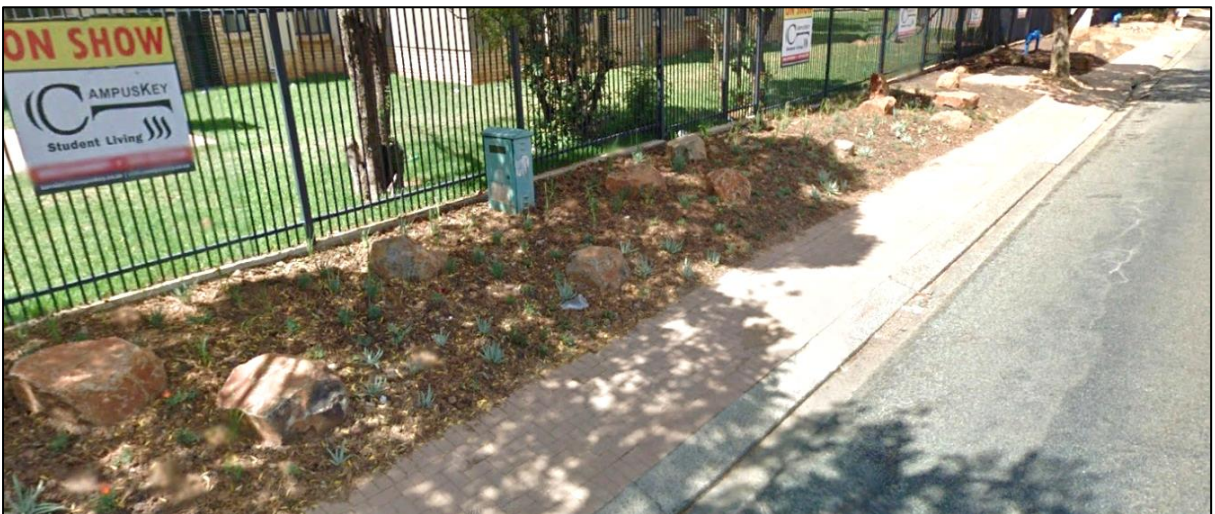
Sidewalk at the Campus Key Student Accommodation, Universitas (Source: Author).
